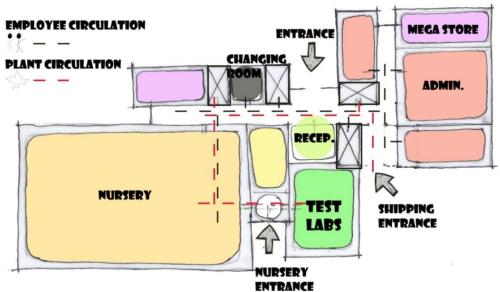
Plan sketch showing human and plant circulation, and spaces organization in ground floor plan
